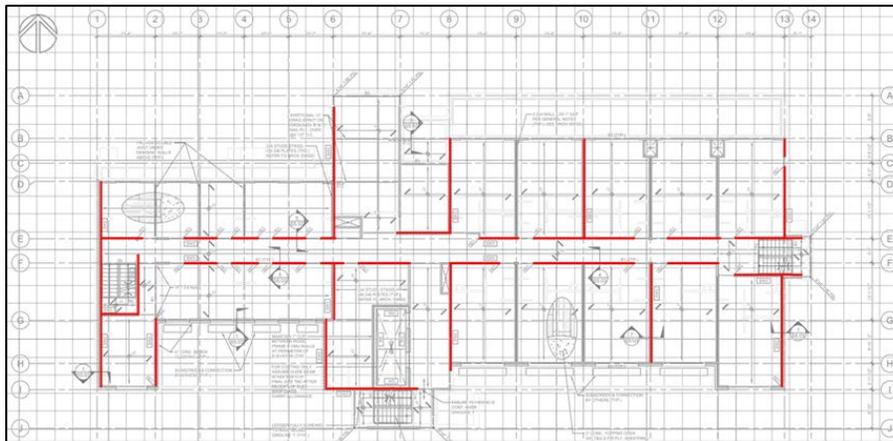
Typical upper floor plan of the building highlighting (in red) nailed plywood shearwalls as SFRS.
